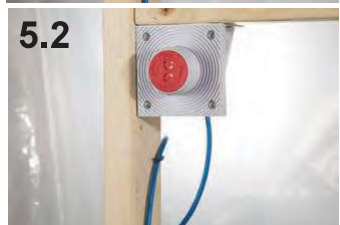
With your location selected and wiring ran, use a wire tie (not included) to fasten the prewire to the rear of the RDM platform. Leave excess cable to be pulled through the RDM insert opening. This will ensure that your prewire does not get damaged or go missing during the other construction stages.
